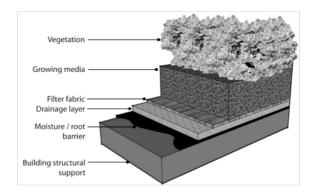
Typical Extensive Green Roof Cross Section (Martin 2009)
